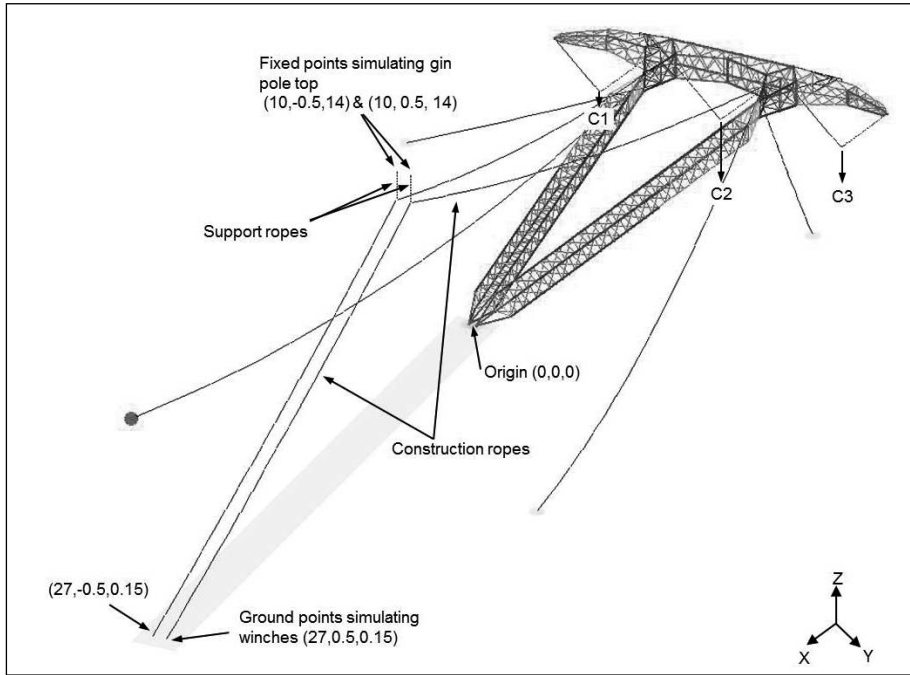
Basic PLS tower modelling of the 520B tower prior to lifting
